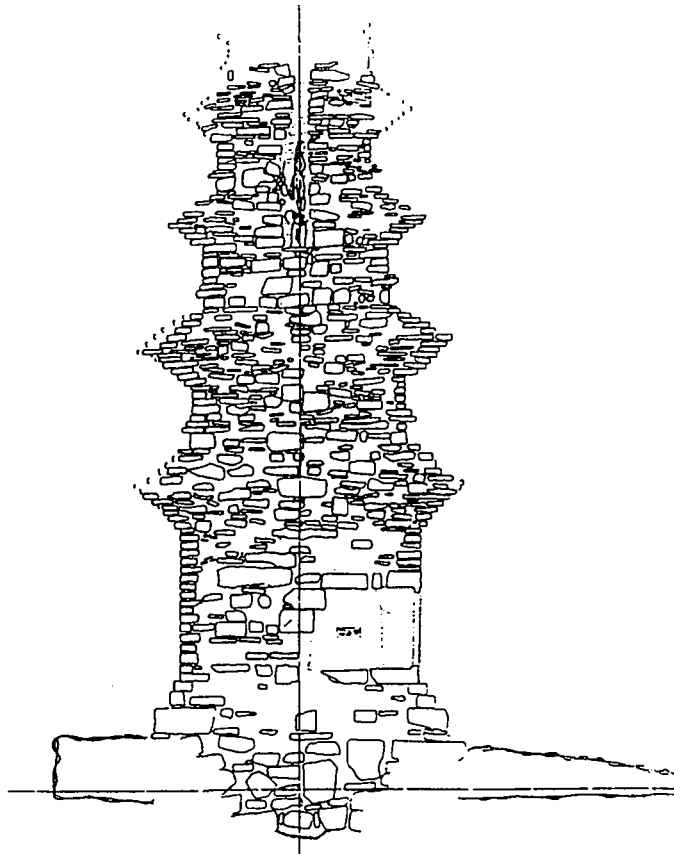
North-south section of the brick-like stone pagoda at Bong-kam-dong 鳳甘洞 佛甘洞
